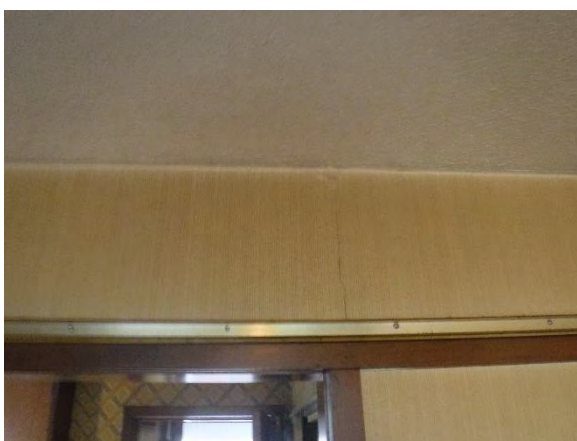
Cracking damage to the internal wall linings (Unit -1).
